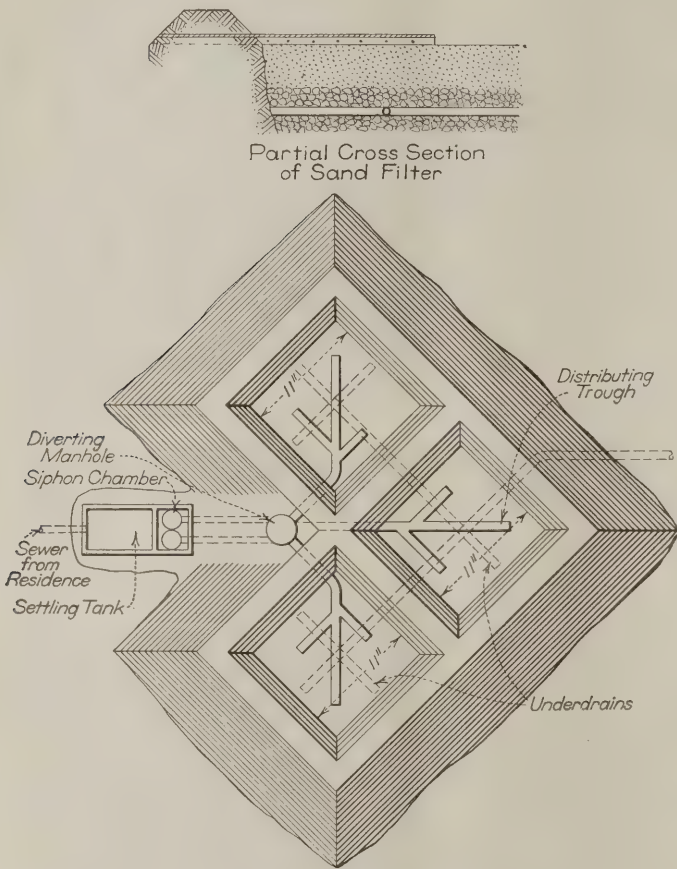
Partial Cross Section and Plan of Sand Filter for Eight People
